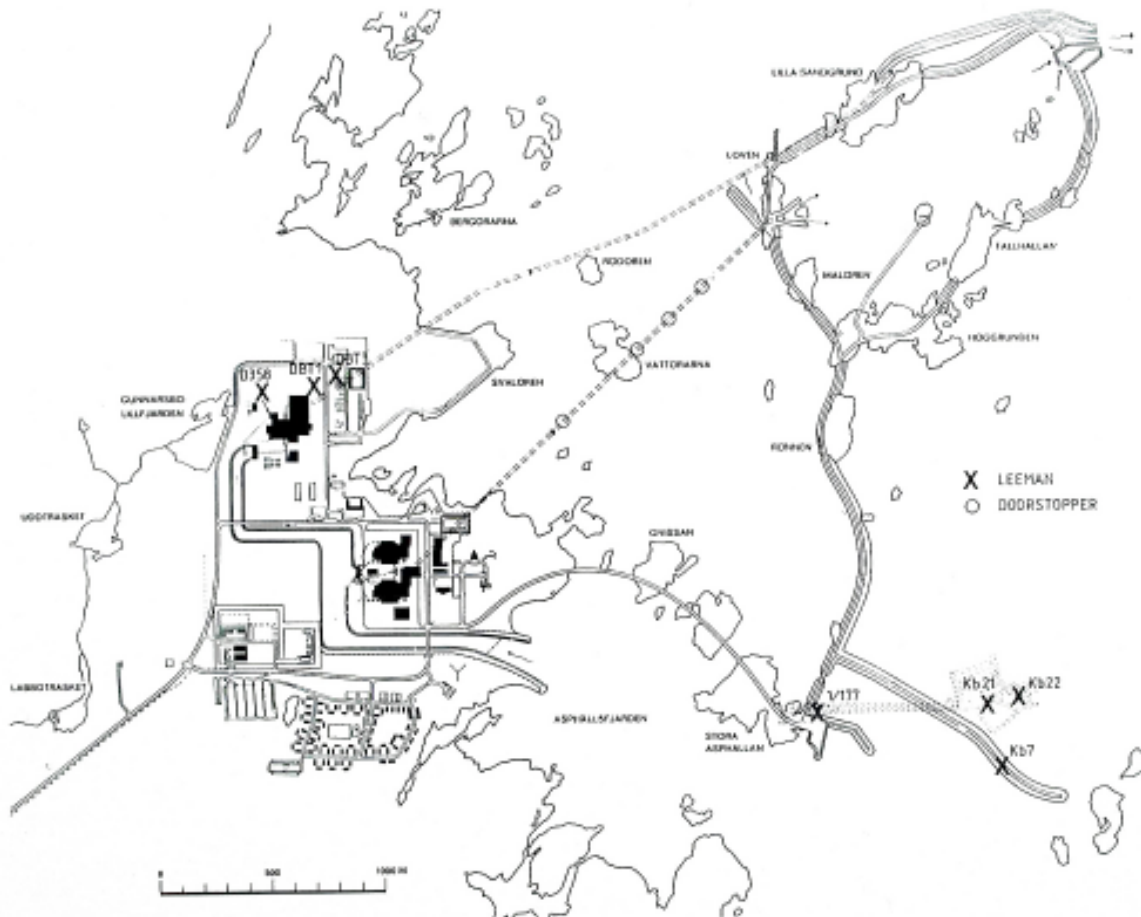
Site plan of the Forsmark Power Plant and the SFR.
